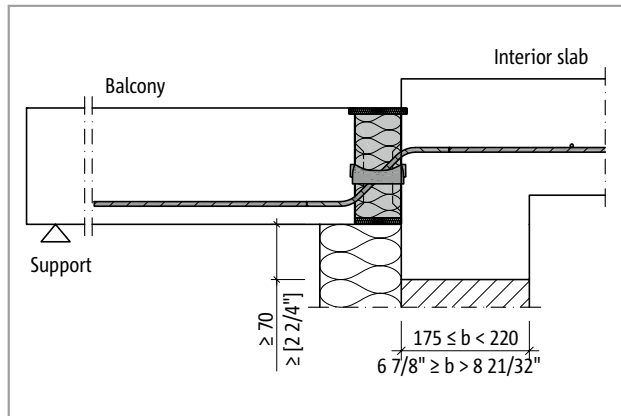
Schöck Isokorb® T Type CQ: Connection for pre-cast balcony slab (e.g. T Type CQ-V1 to CQ-V5)
